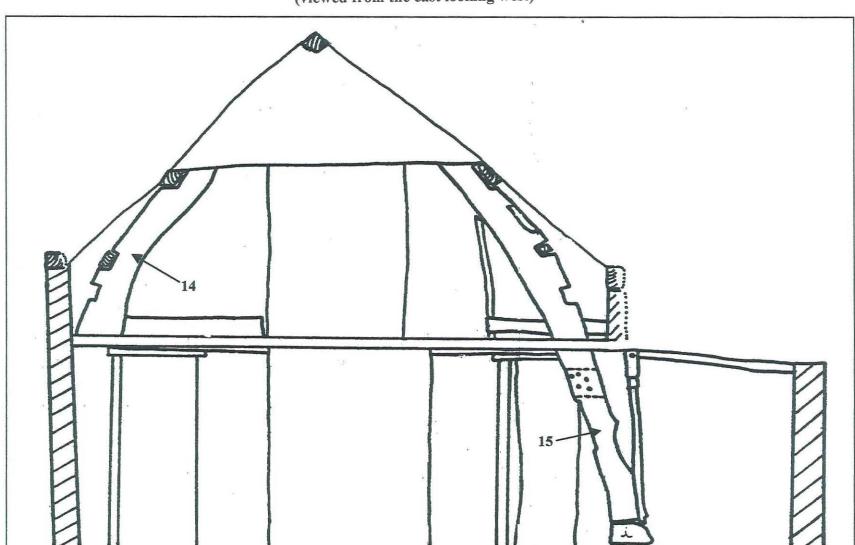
Drawing of the cruck truss to show timbers sampled (viewed from the east looking west)
